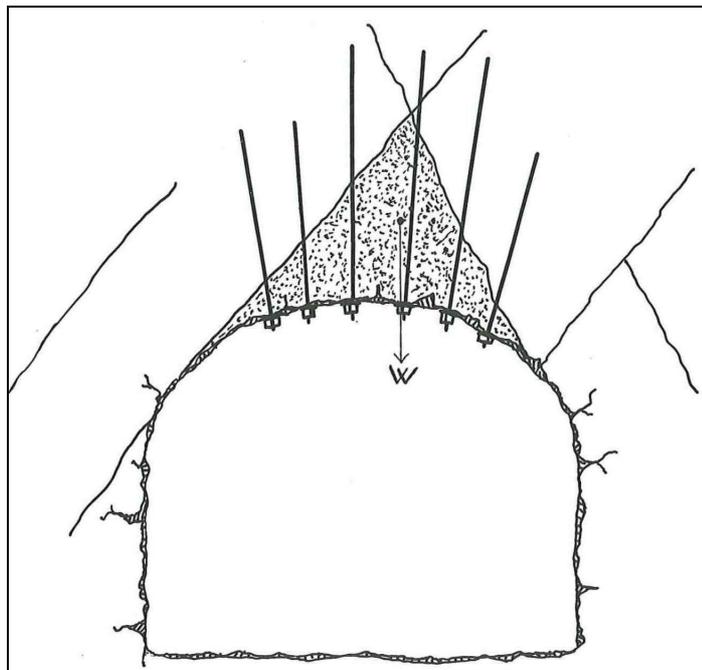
Rock bolt support for a falling roof wedge (after Stillborg, 1994)
